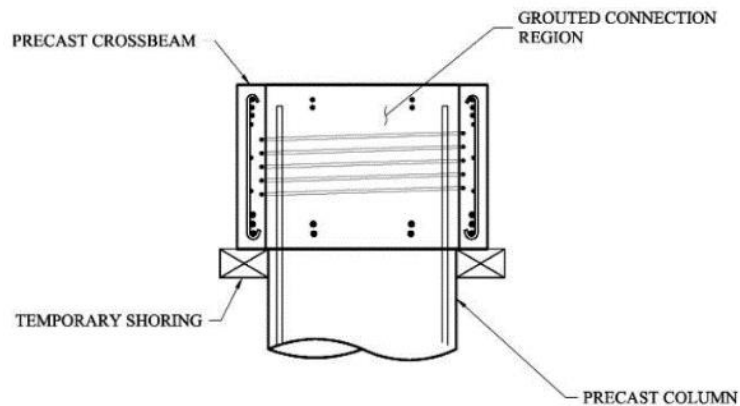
Column and cap beam complete opening connection (Hieber et al. 2005)
